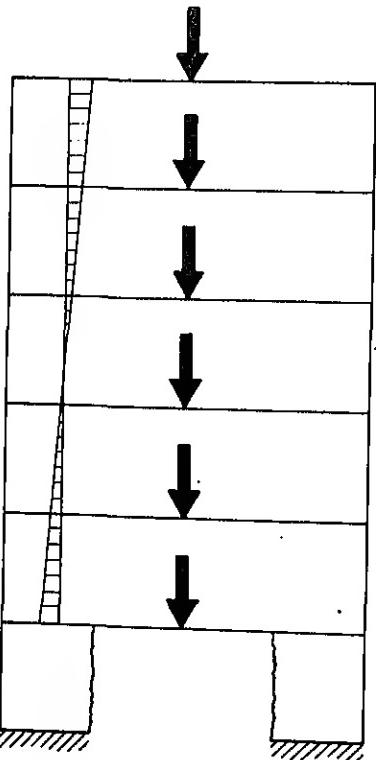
Beam Mode - Vertical Wall Panel Stacks
